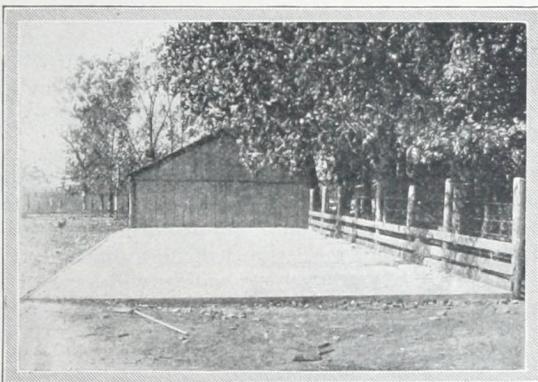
A Concrete Feeding Floor near Centerville, Indiana.
